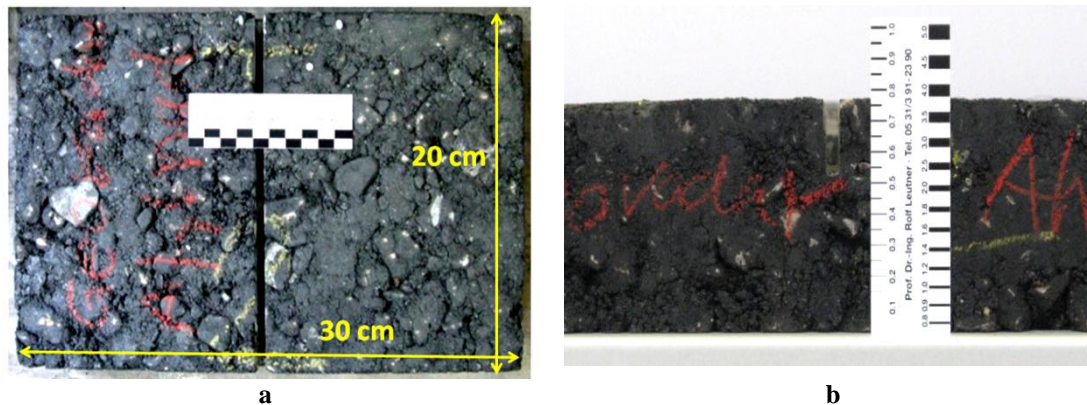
Laboratory specimen AA (a) top view, (b) cross-section view
